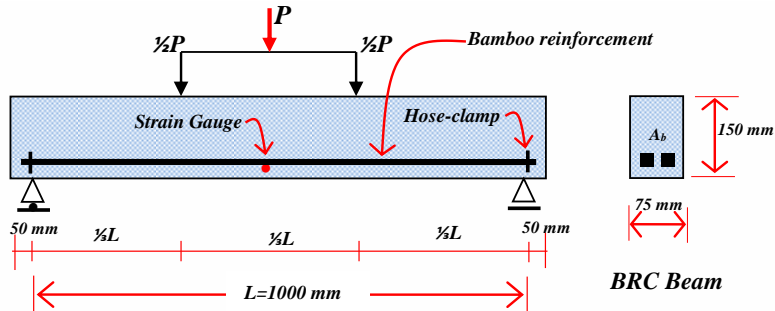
Detail and geometry of the bamboo reinforced concrete beam
